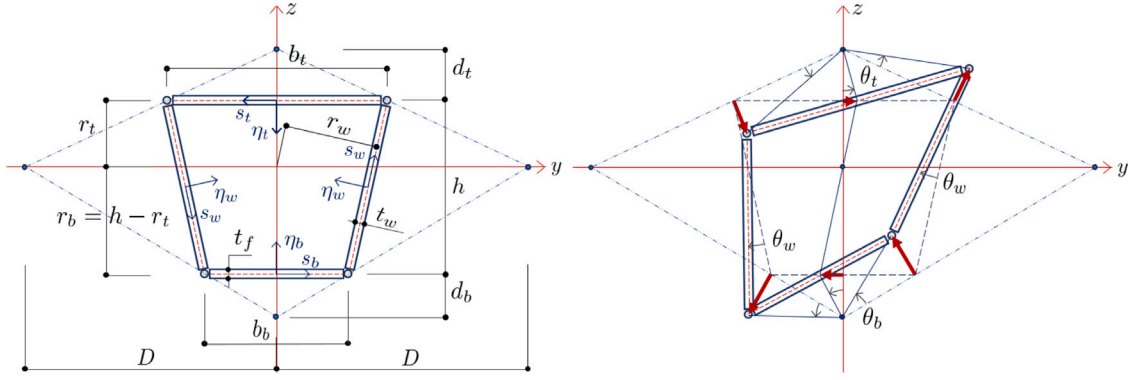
General distortional pattern of a symmetric box girder cross section.
